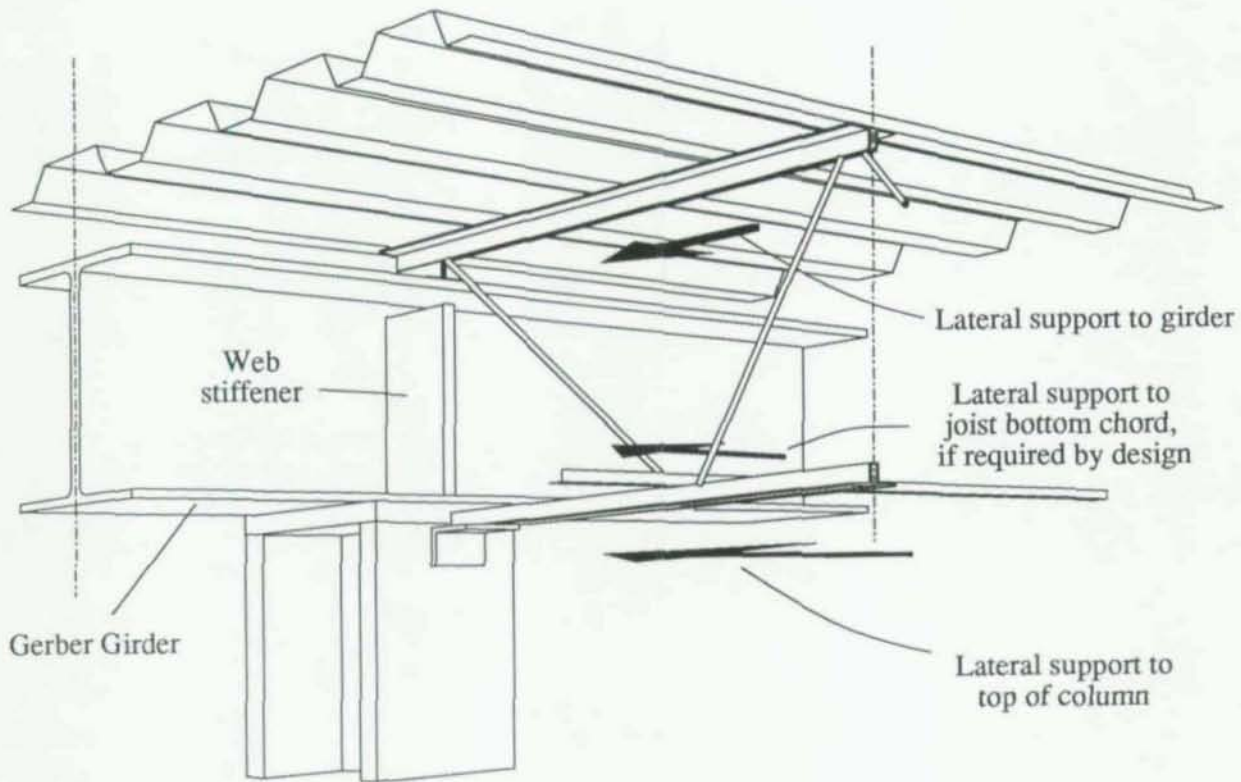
Lateral Supports at Joist-Girder-Column Joint
